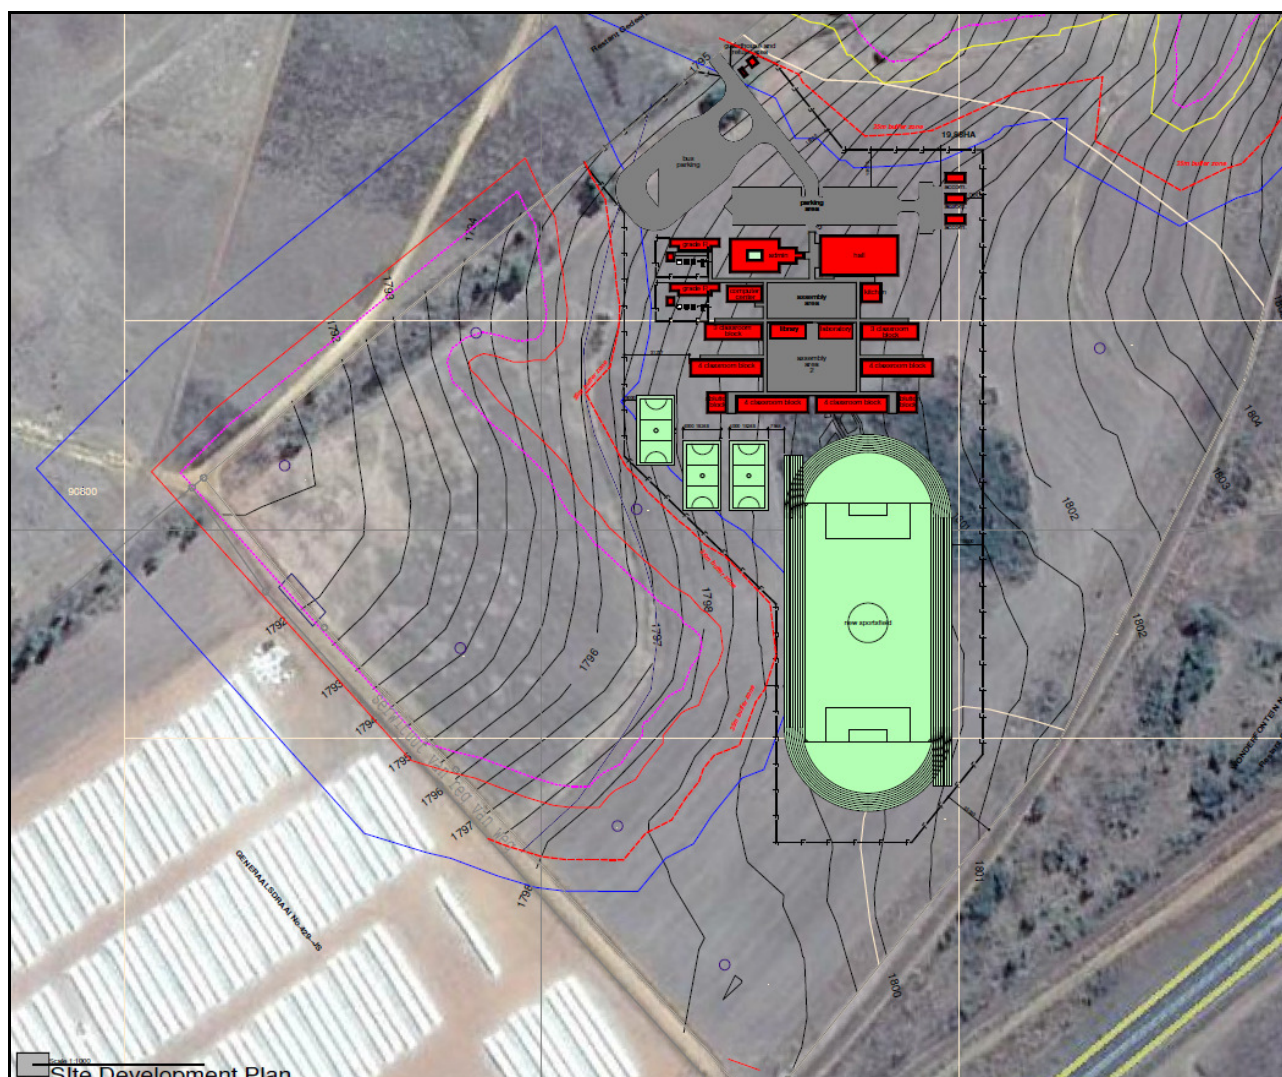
Layout Plan No 2 (taken from Bakopane Architects, 2016)
